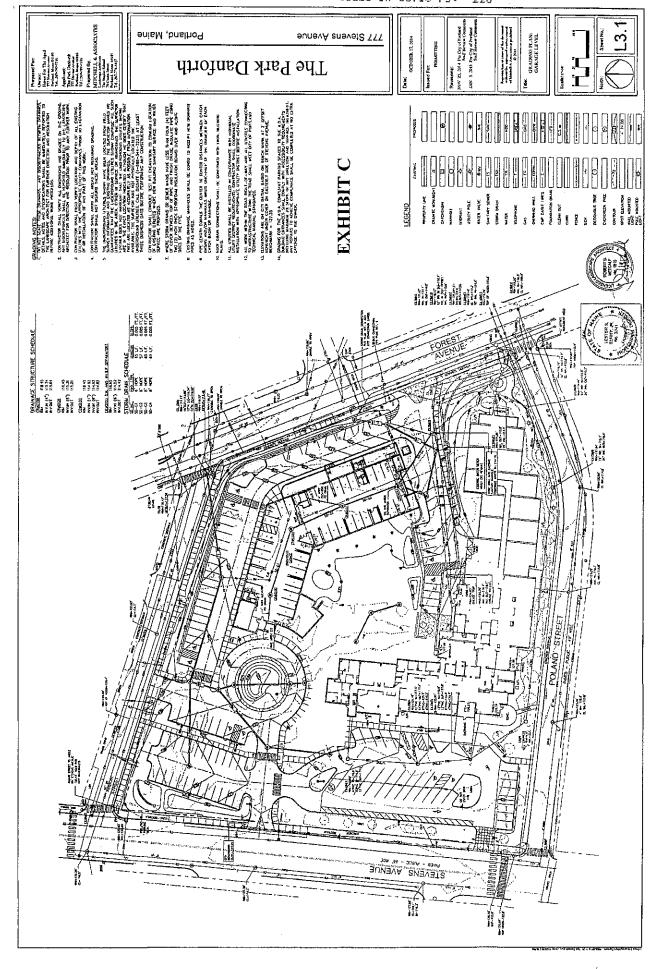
Exhibit C: Approved Grading Garage Plan Sheet L3.1
